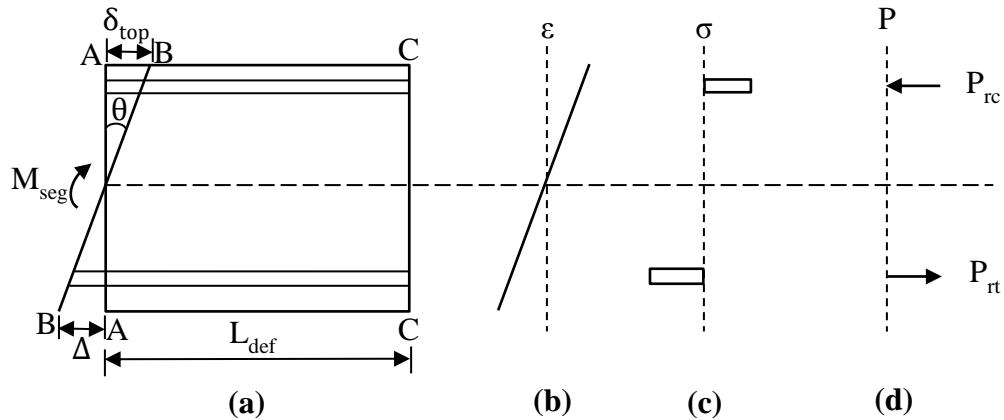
Separating elements of RC beam (Reinforcement element)
